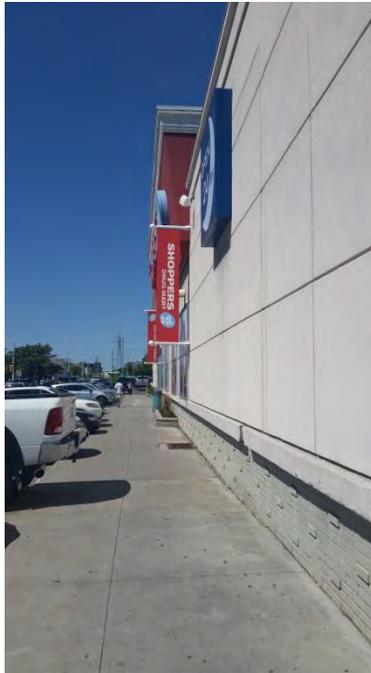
South wall of the Shopper's Drug Mart (facing west).
